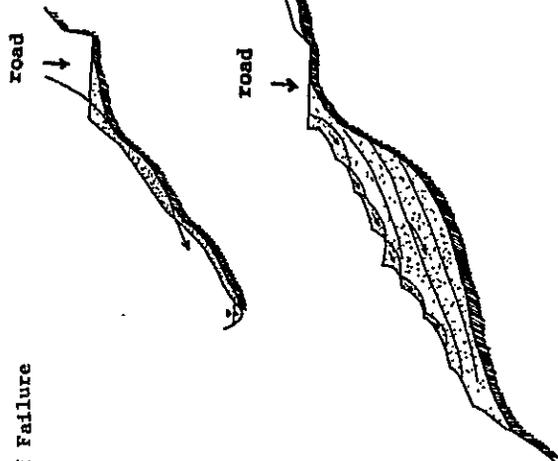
(e) Schematic Section of Failure of The Shoulder and Road
